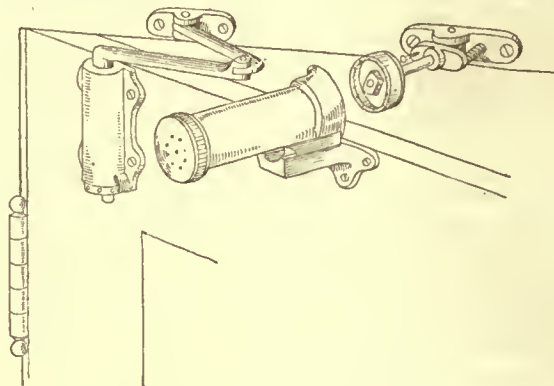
Eclipse Door-check and Spring. Sargent & Co.
